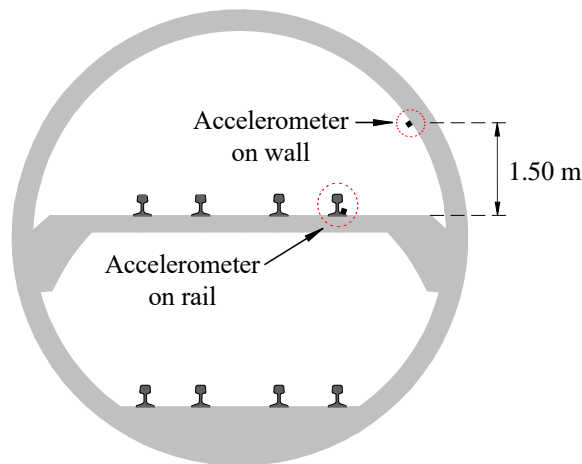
Schematic of the double-deck tunnel and the mounting locations of the accelerometers on the wall and rail.
